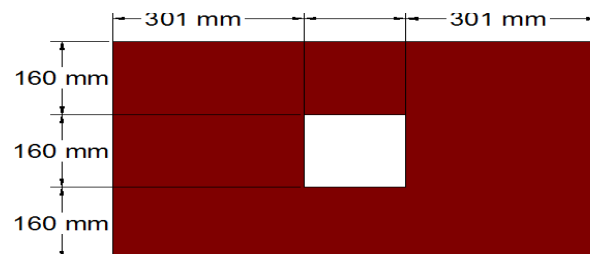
(d) Middle center opening in the wall (MCO)
